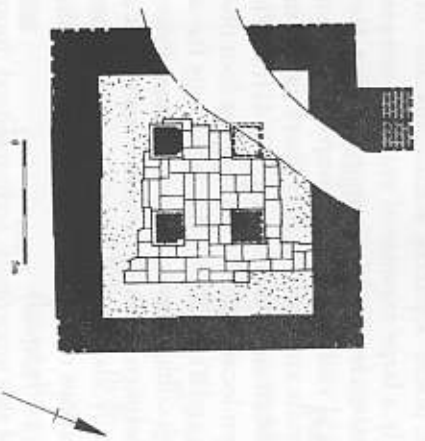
Enselale: plan of central building (after Anfray 1978)
